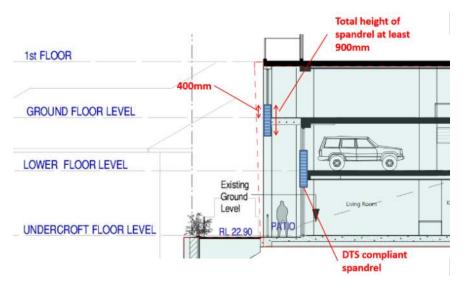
Location of the proposed spandrel that is 400 mm above the slab level of the ground level (south / rear section shown)
